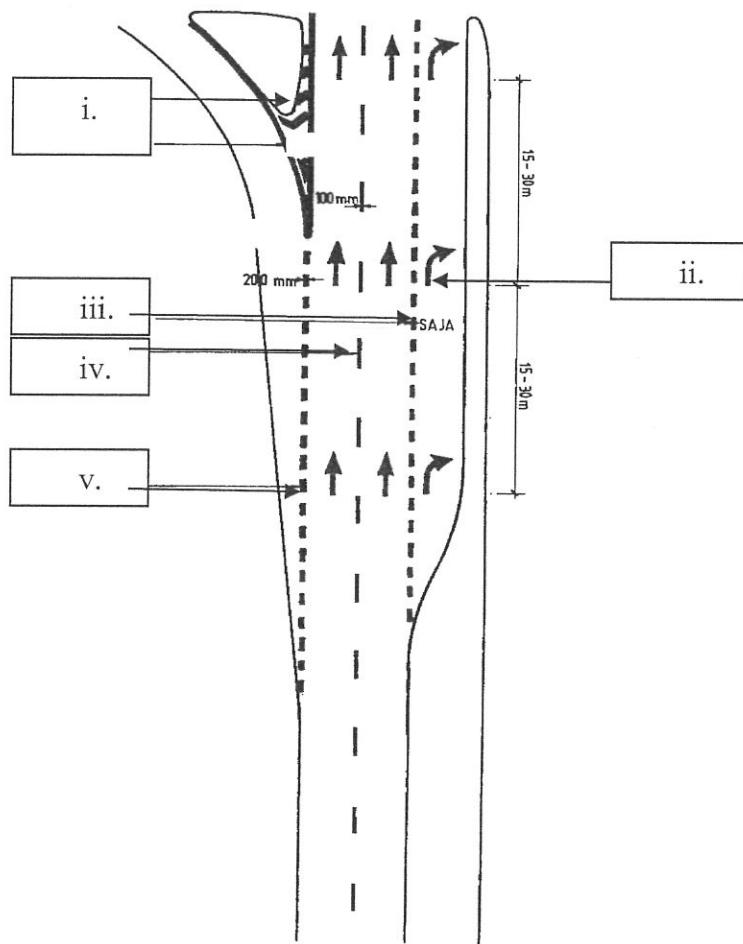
PAVEMENT MARKING ON URBAN STREET
